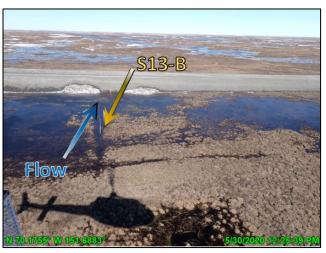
Ponding near S13 along the south embankment, looking north; May 30, 2020
